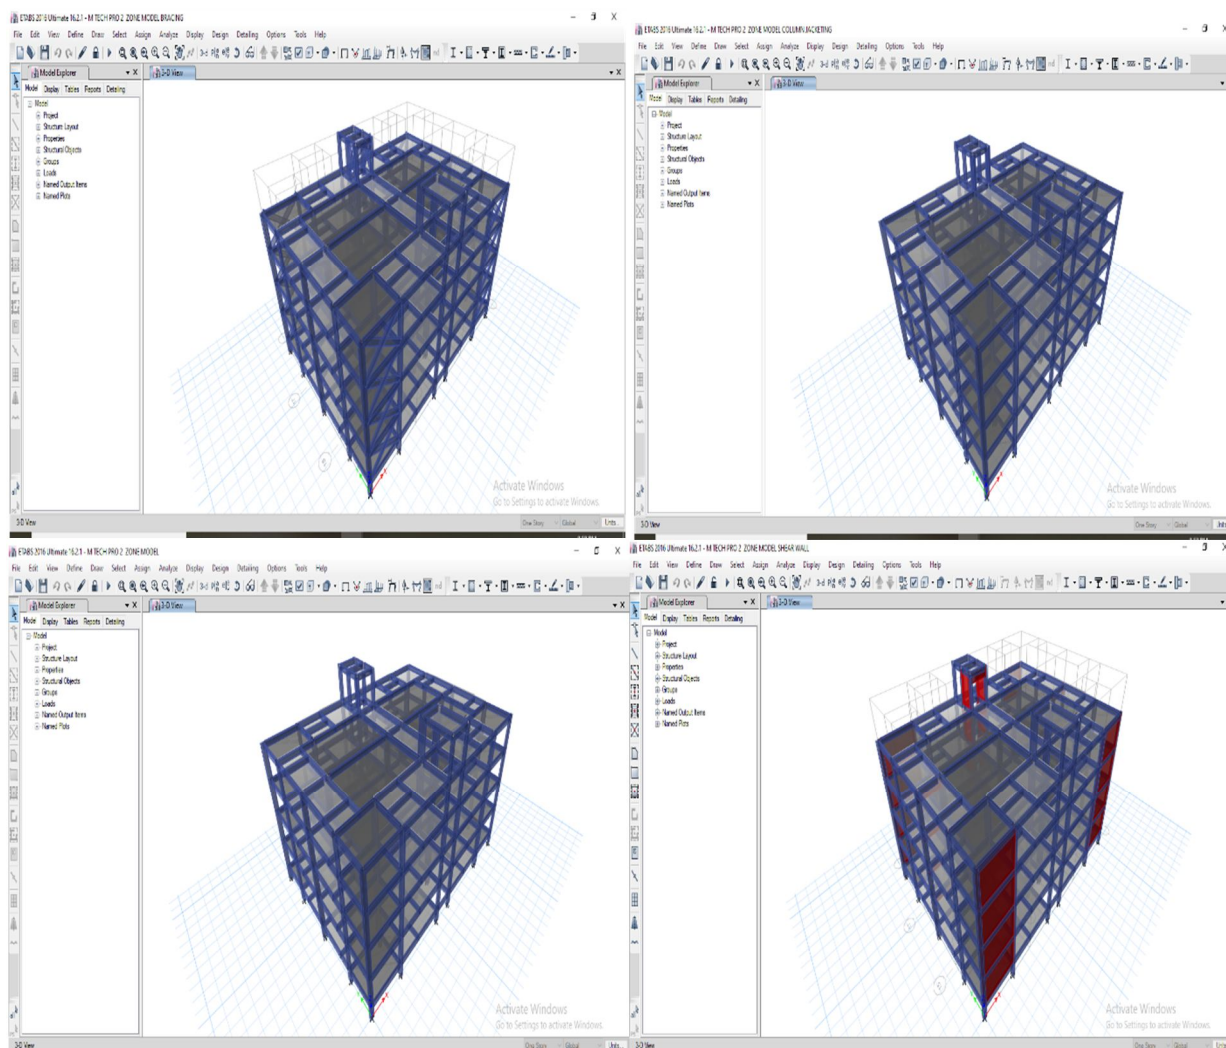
3D view of the Bracing, Column Jacketing, Regular and shear wall structure
